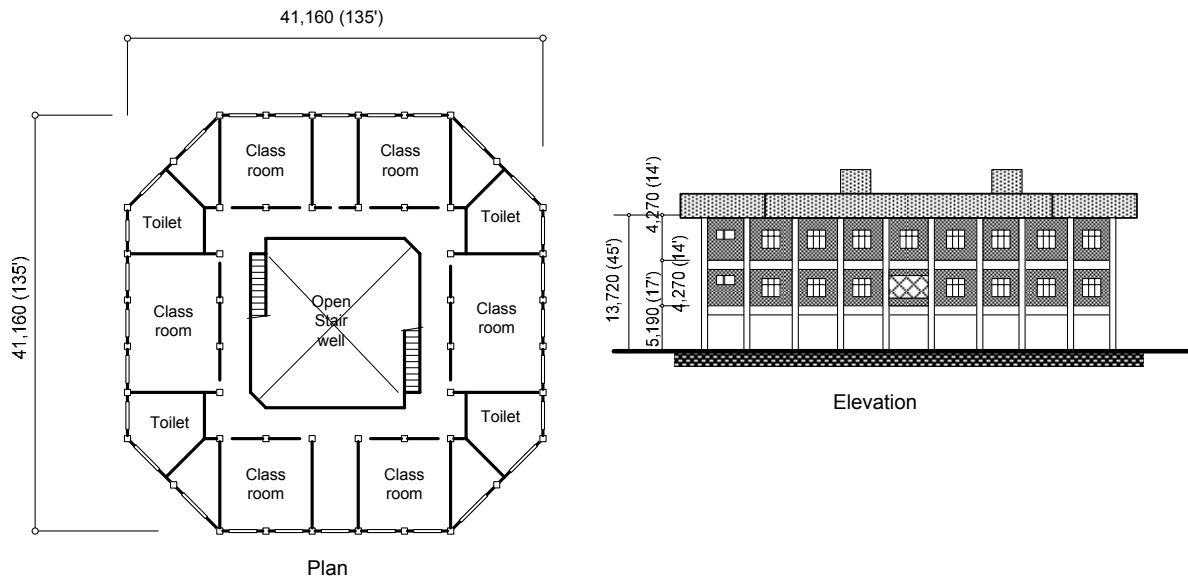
Cyclone Shelter Plan of the Department of Public Works (Example)
